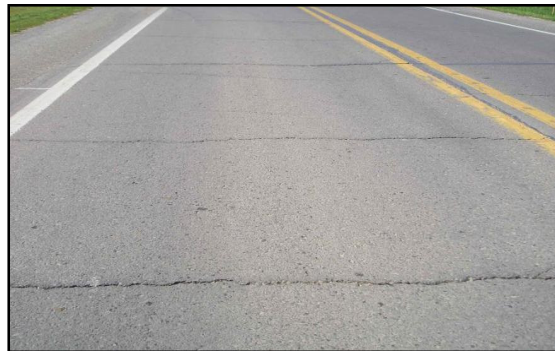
Thermal Cracks in Asphalt Pavement
